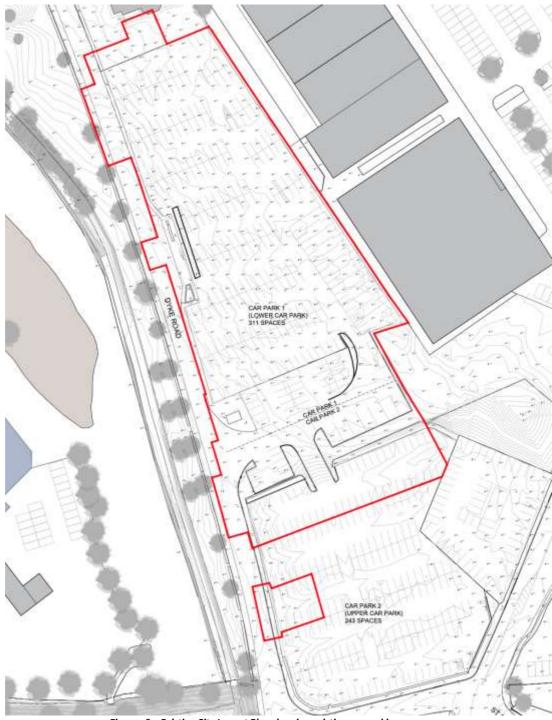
Existing Site Layout Plan showing existing car parking spaces
